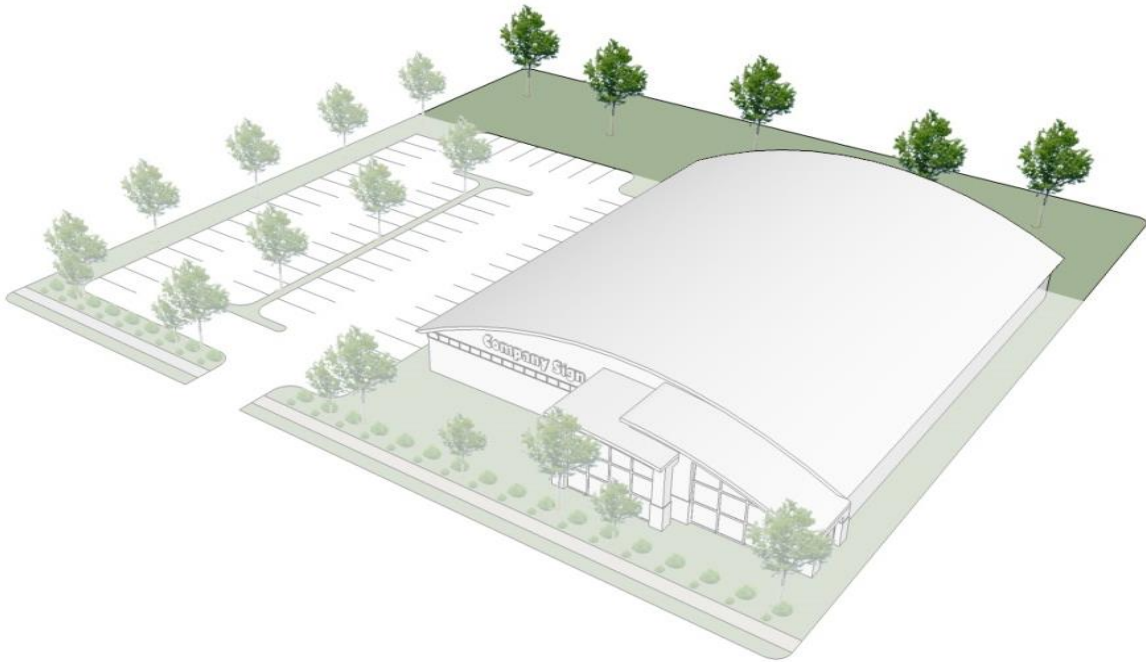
NON-RESIDENTIAL BUILDING YARD EXAMPLE
